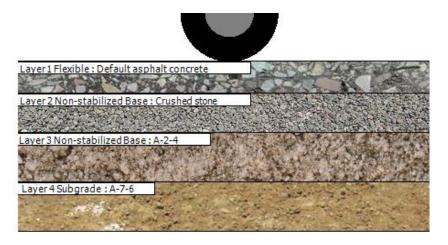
Pavement section from AASHTOWare Pavement ME Design.
